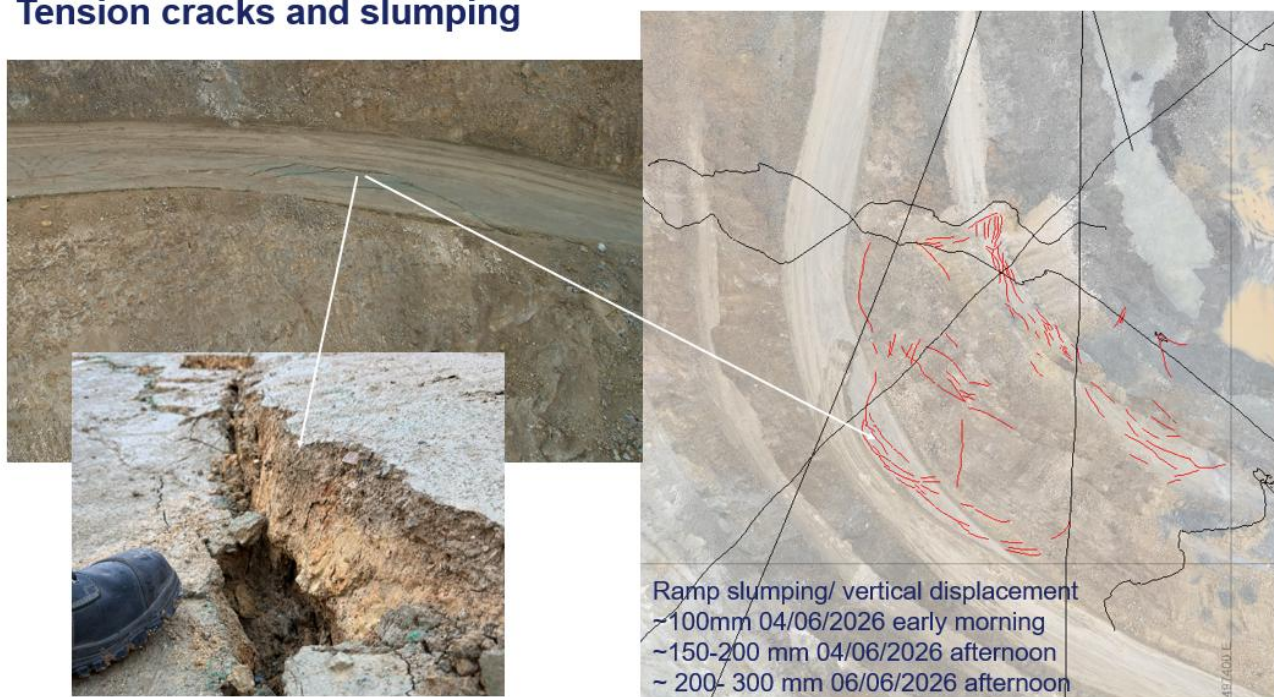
Pearse South Open Pit tension cracks and slumping in the ramp on the southern wall.
